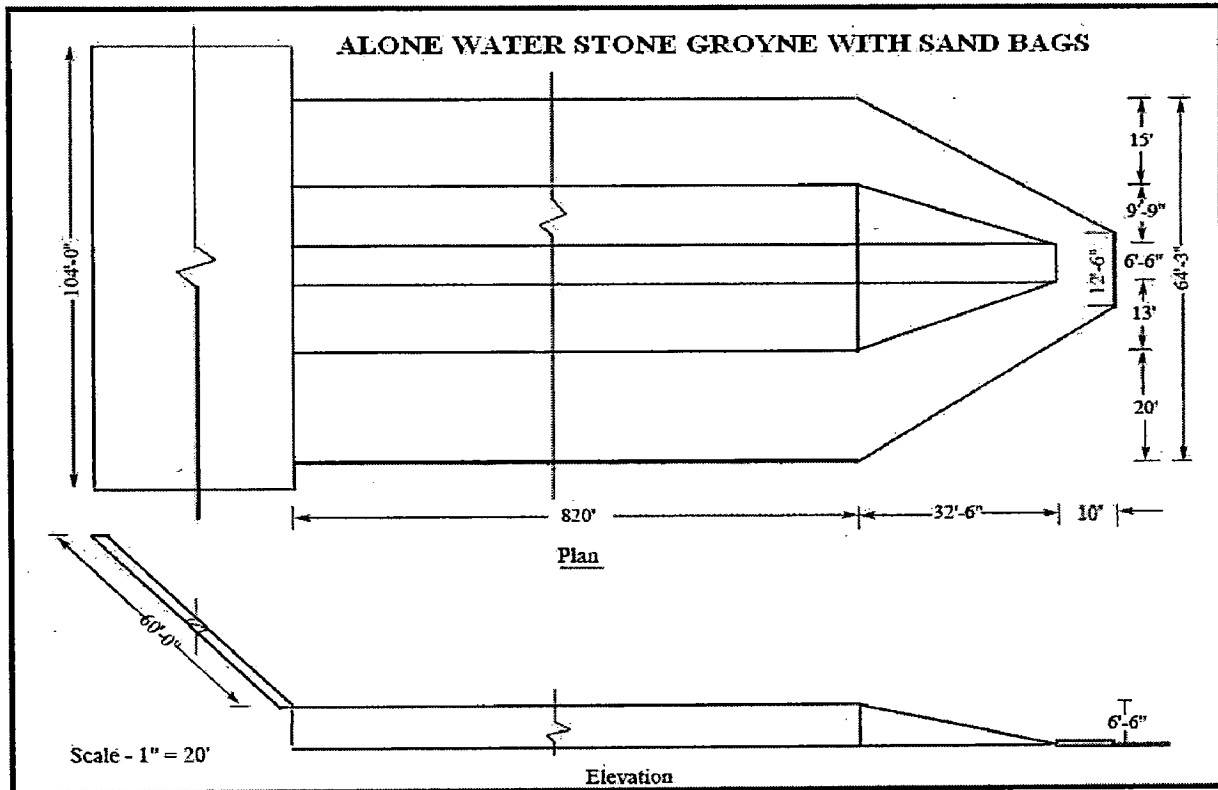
Plan & Elevation of Structure at Alone waterway
